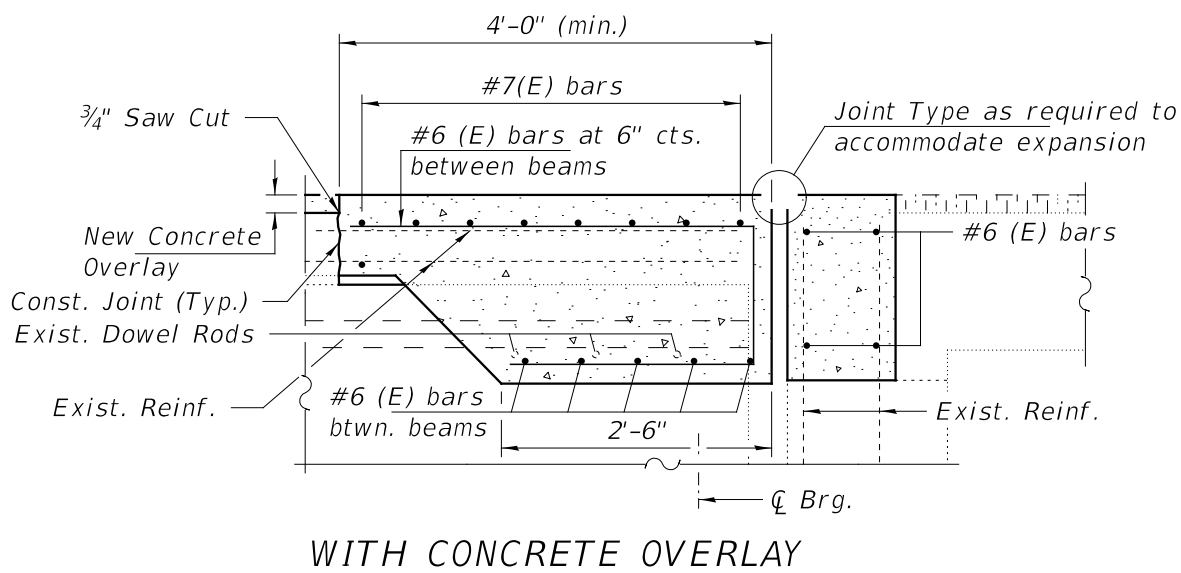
Joint Reconstruction for PPC I-Beams
